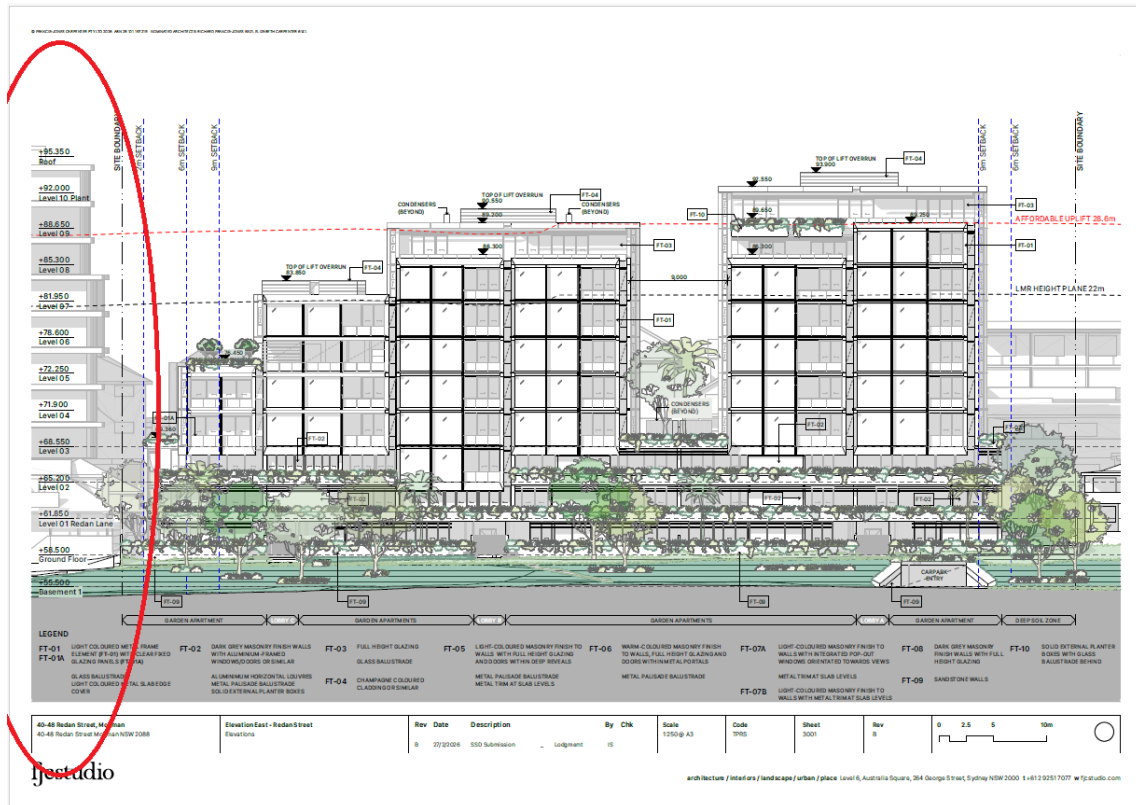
Mark-up of East Elevation from Architectural Plan set – FJC Studio
